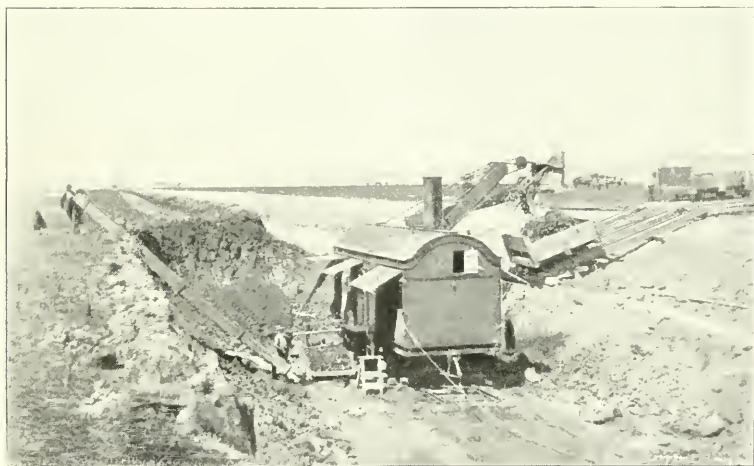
View showing steam shovel at work near station 165, north bank, loading car at channel end of inclined conveyor; empty car on top of bank; capstan for moving trestle approach on right of steam shovel dipper; second cut, looking northwest from station 164. Section M, June 29, 1894.
